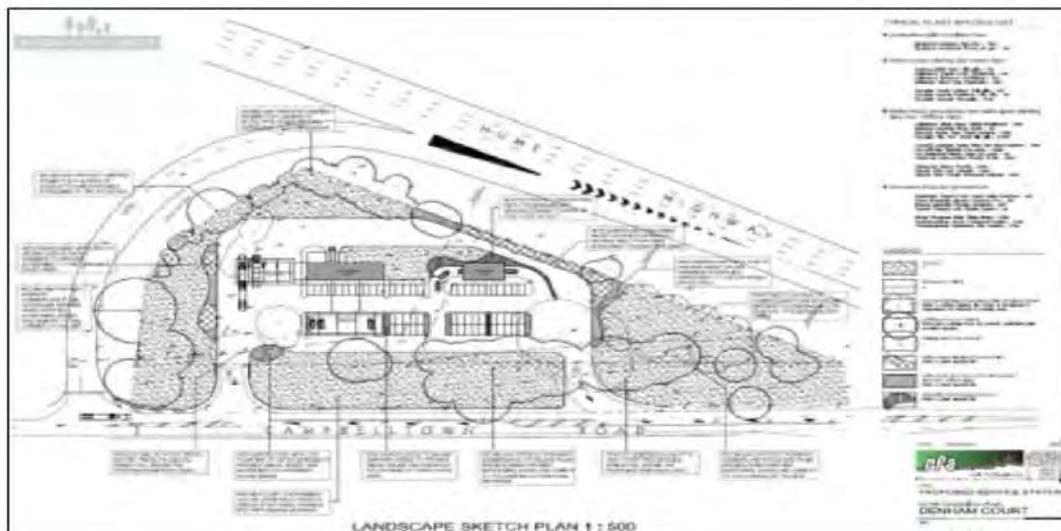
Landscape sketch plan. Source- by RFA Landscape Architects
